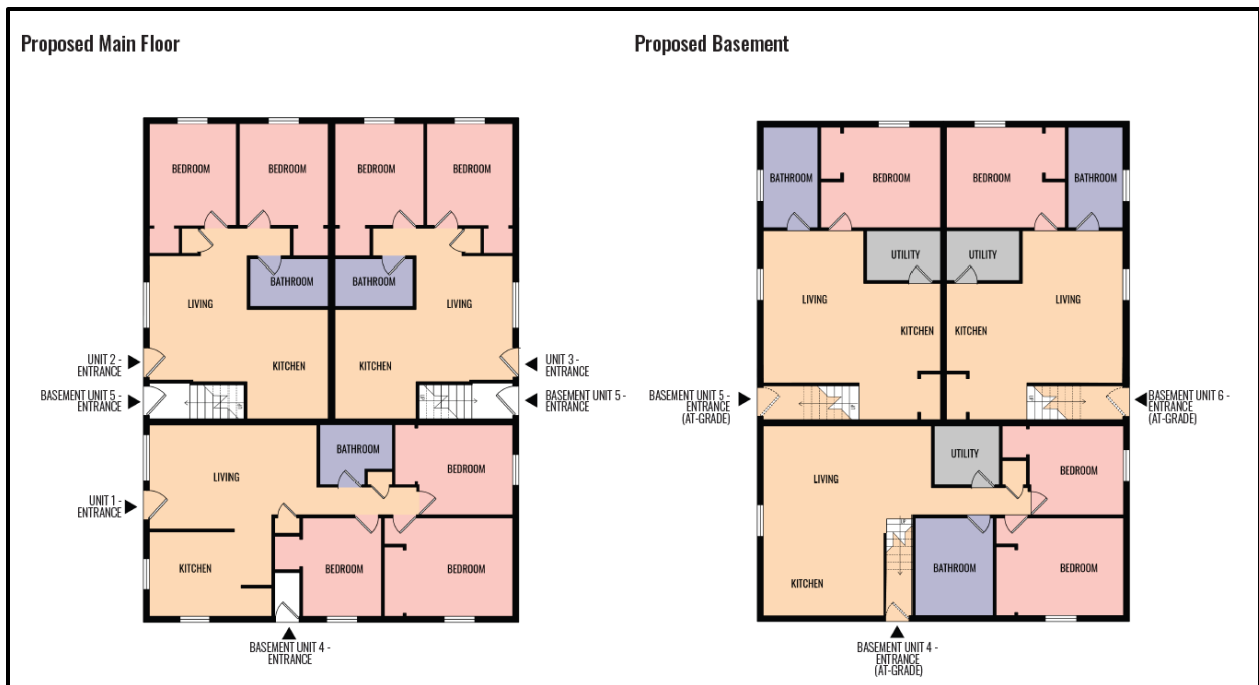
Floor Plan of the proposed 6-unit converted dwellings.
